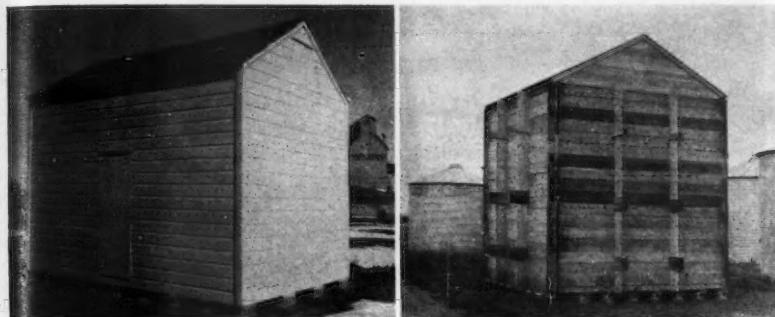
(Left) A 1600-bu pre-cut wood bin. The dimensions are 12x16x10 ft • Fig. 3 (Right) A bin of tongue and groove wood planks. Notched horizontal ties and uprights provide the necessary strength to resist the grain pressures. Nails are required only for roof and floor. Dimensions, 14 ft 9 in x 14 ft 9 in x 17 ft. Capacity, 2950 bu
